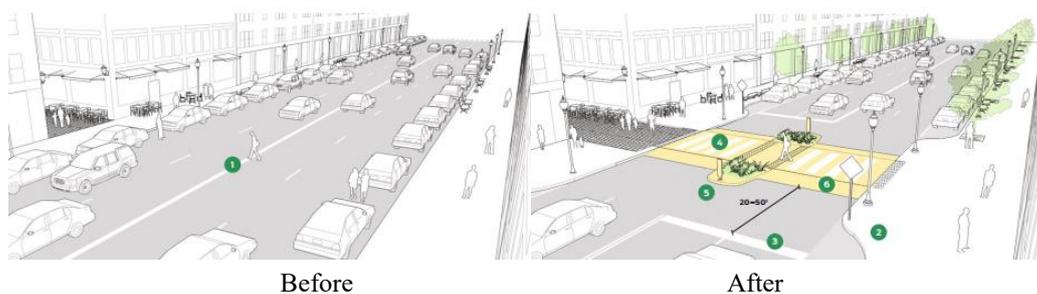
Existing and reconstruction road using midblock crosswalk for safety cross.
